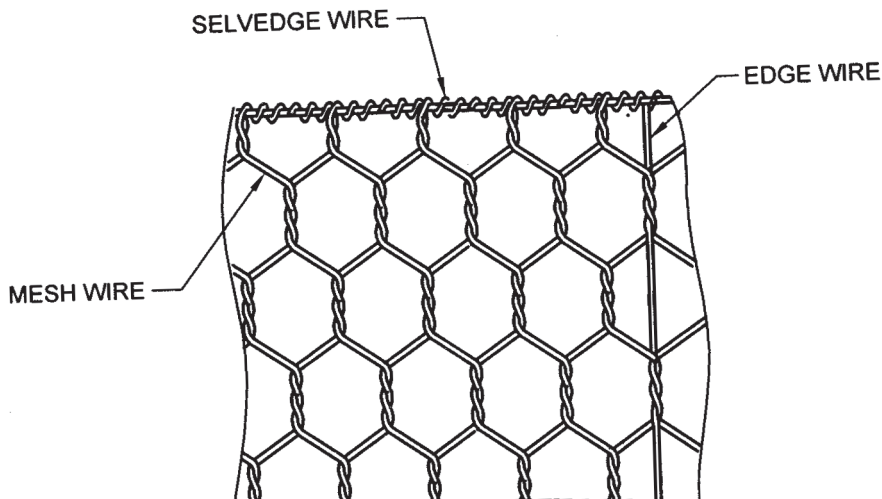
MESH WIRE, SELVEDGE AND EDGE WIRE
